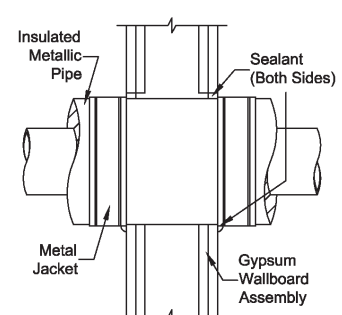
BARE & INSULATED METALLIC PIPE PENETRATIONS - RATED GYPSUM WALLBOARD ASSEMBLIES
